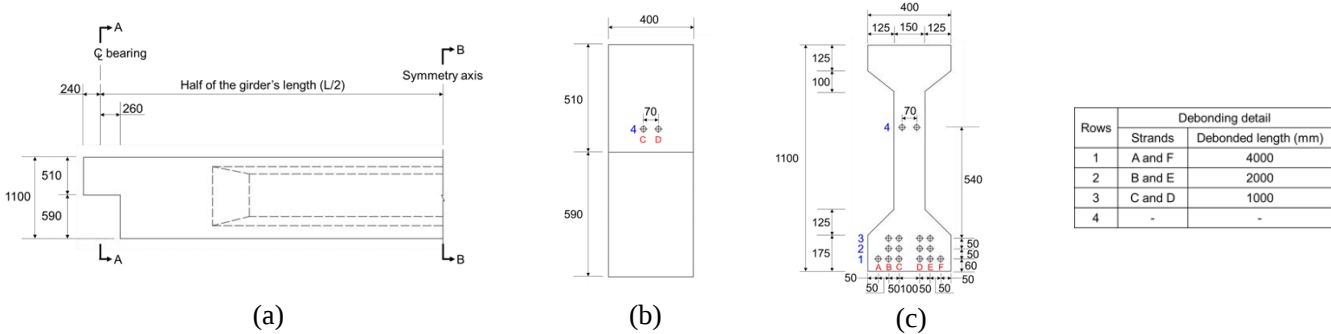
Structural details of PC I-girder: (a) side view, (b) section A-A, and (c) section B-B (Unit: mm)
